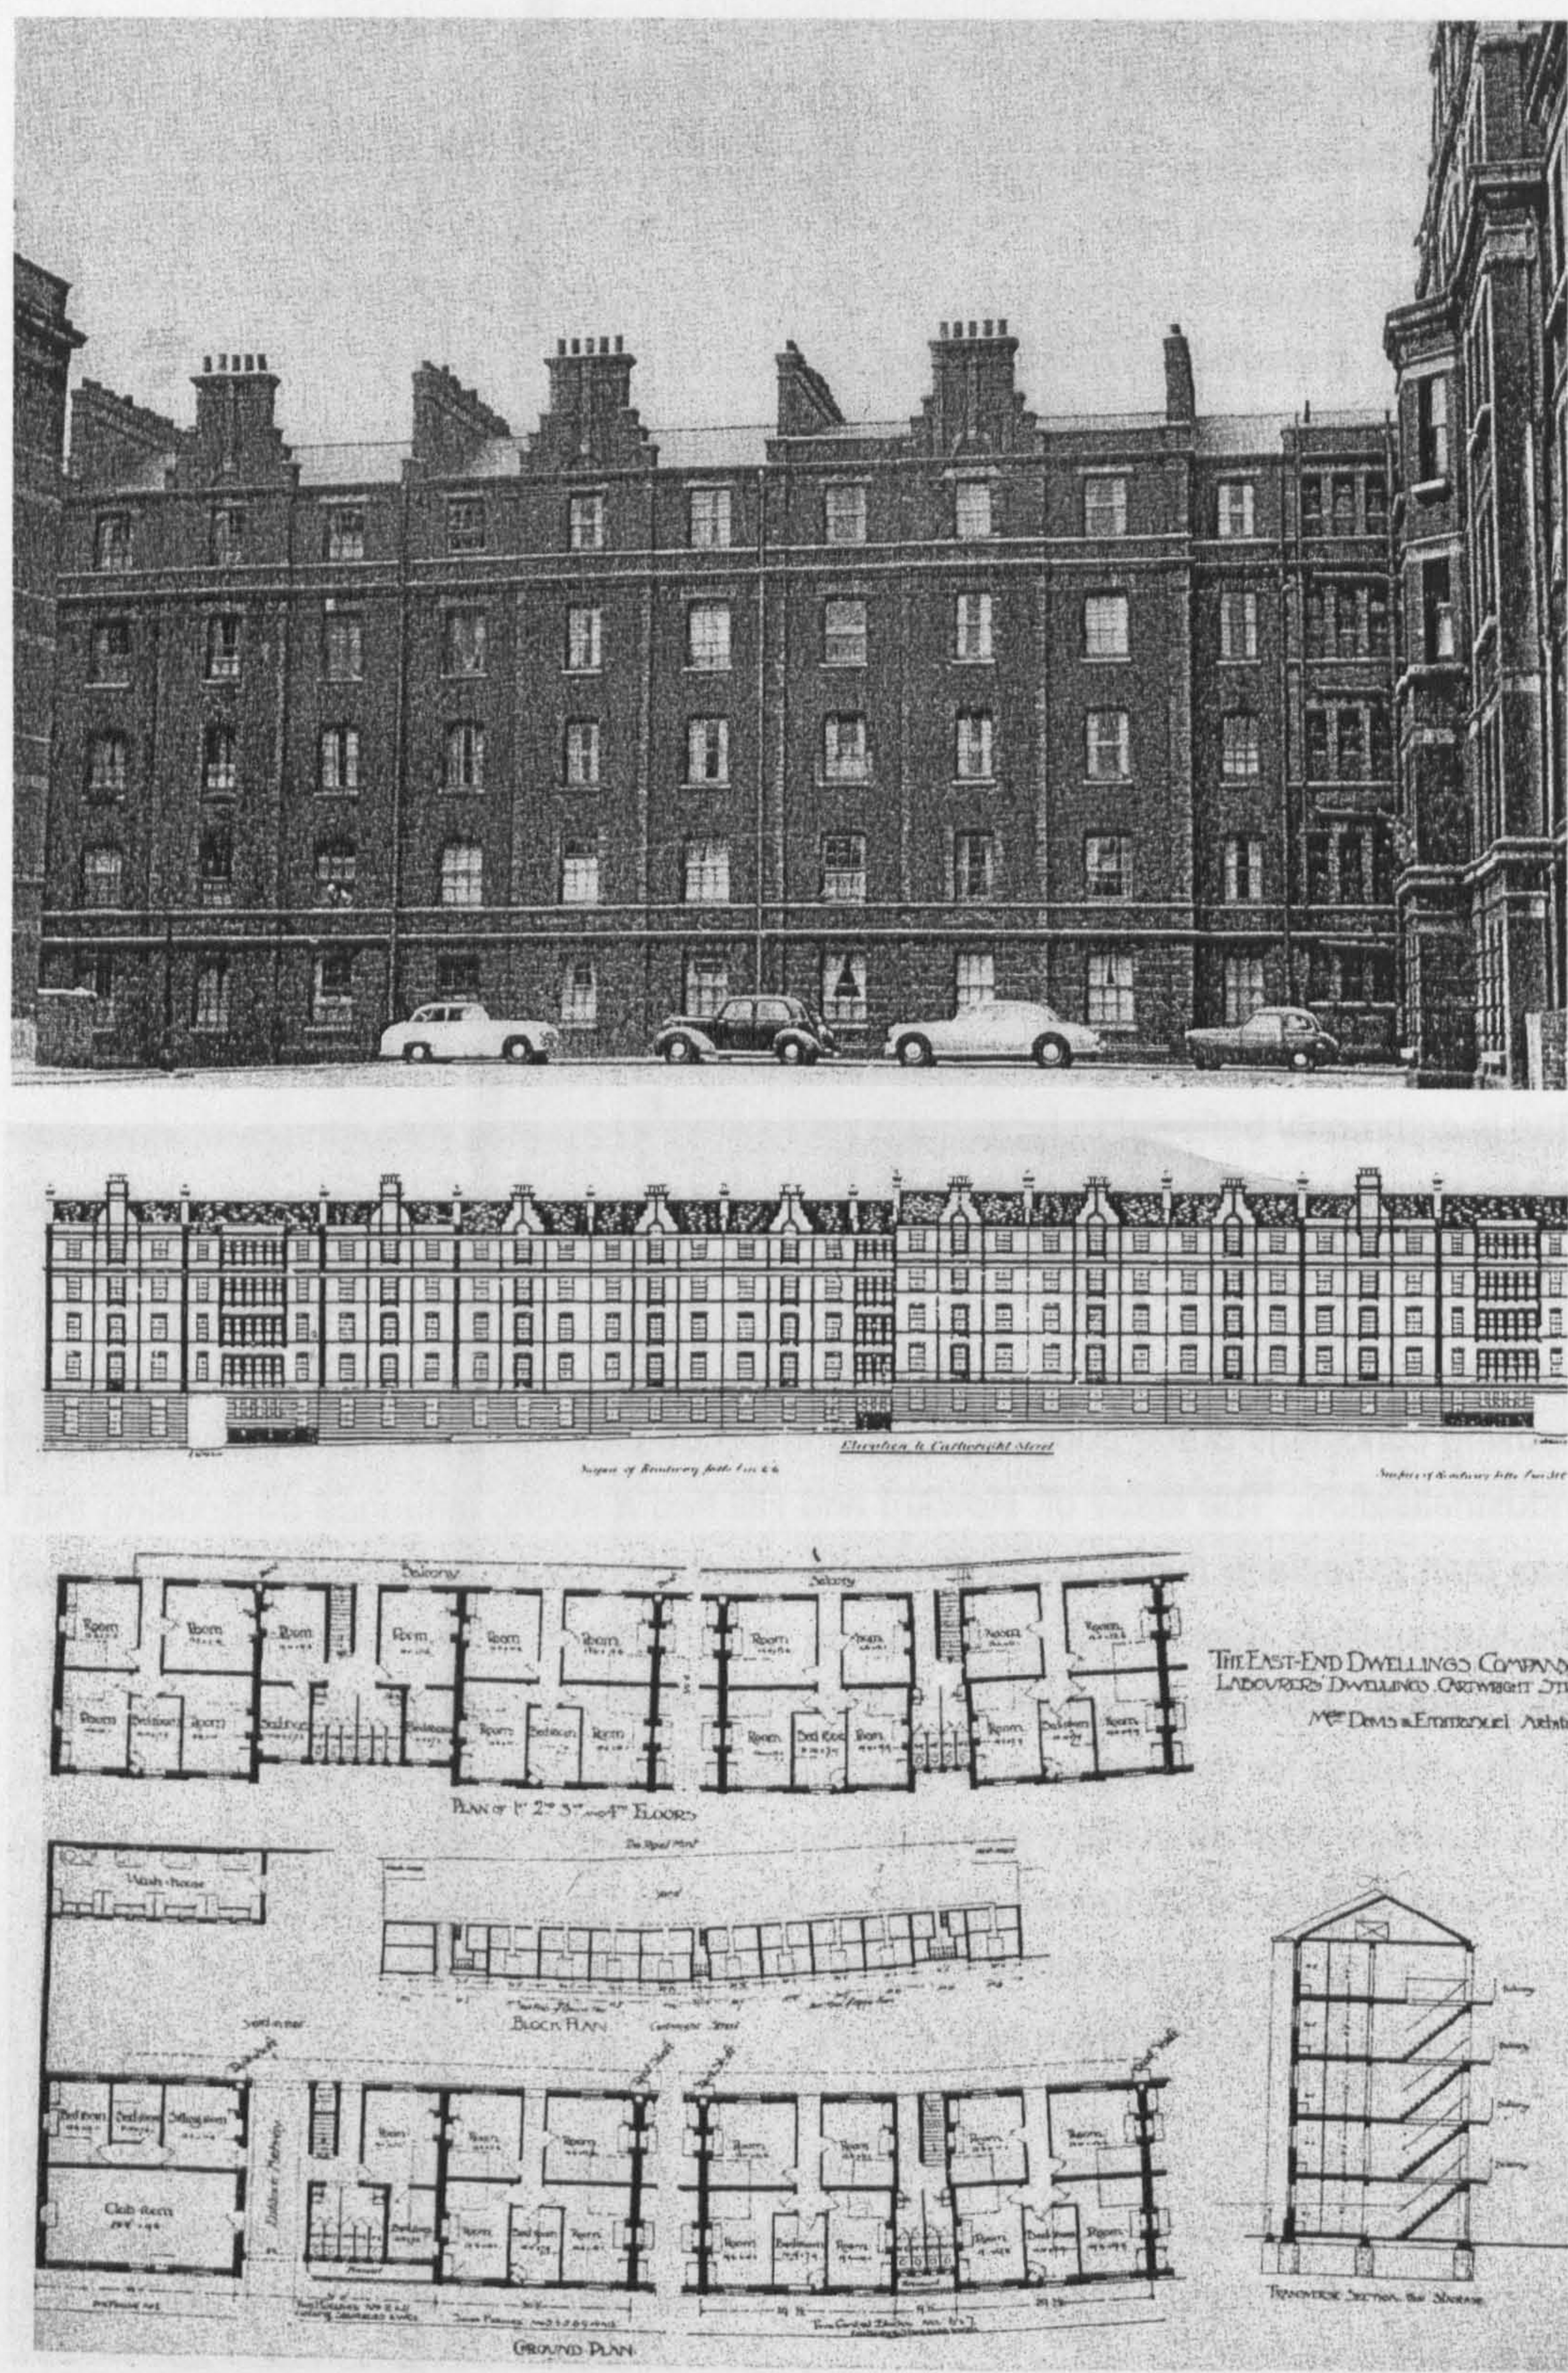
, 75, 76: View, plan and elevation, Katherine Buildings, Cartwright St, London (1885)
